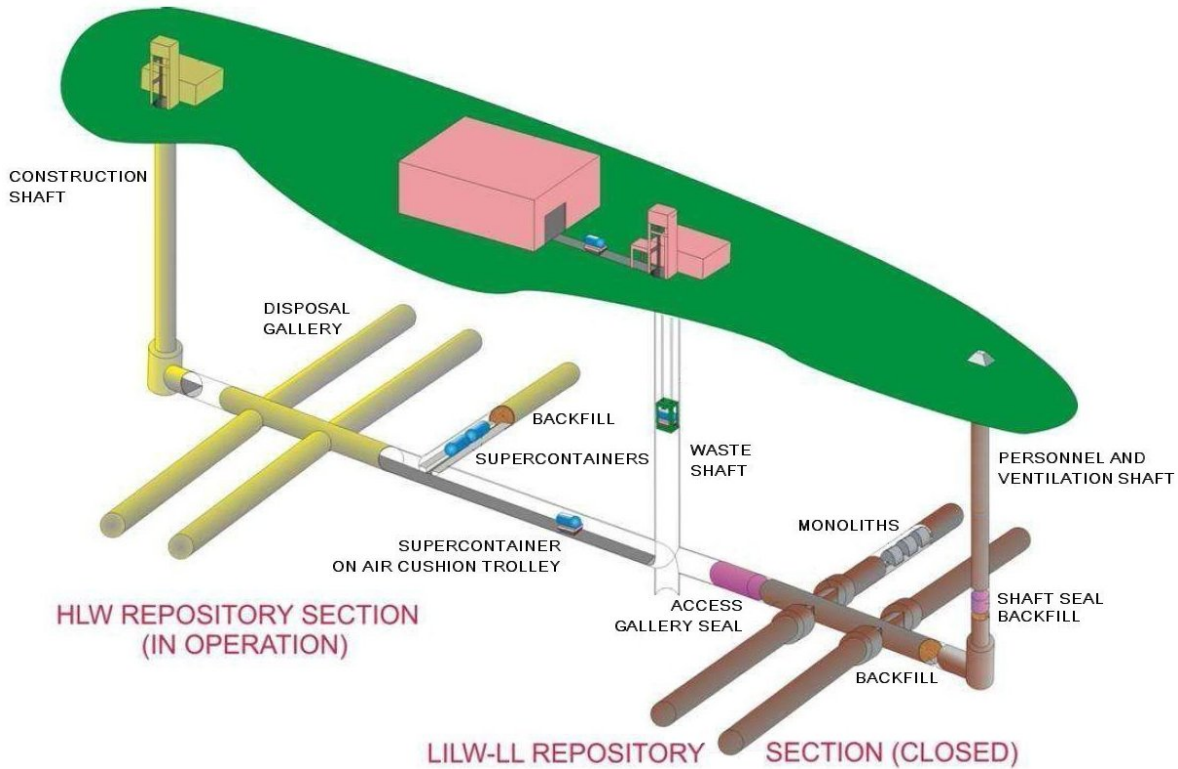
Repository design consisting of a category B waste section and a category C waste section [1].
